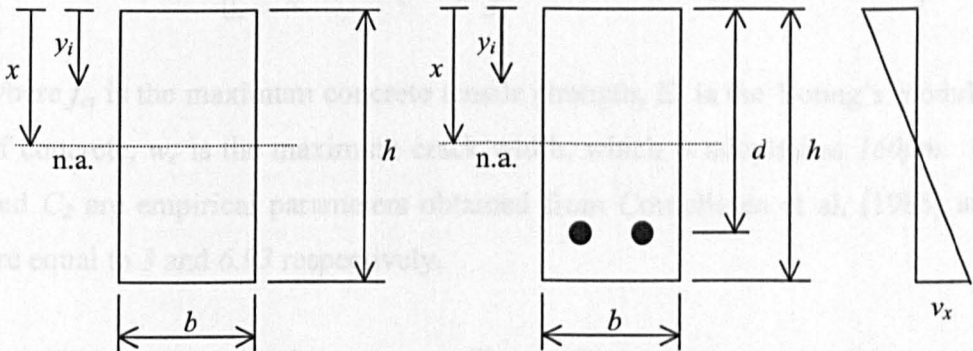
Section of a) plain concrete and b) reinforced concrete beam and c) applied deformation profile
